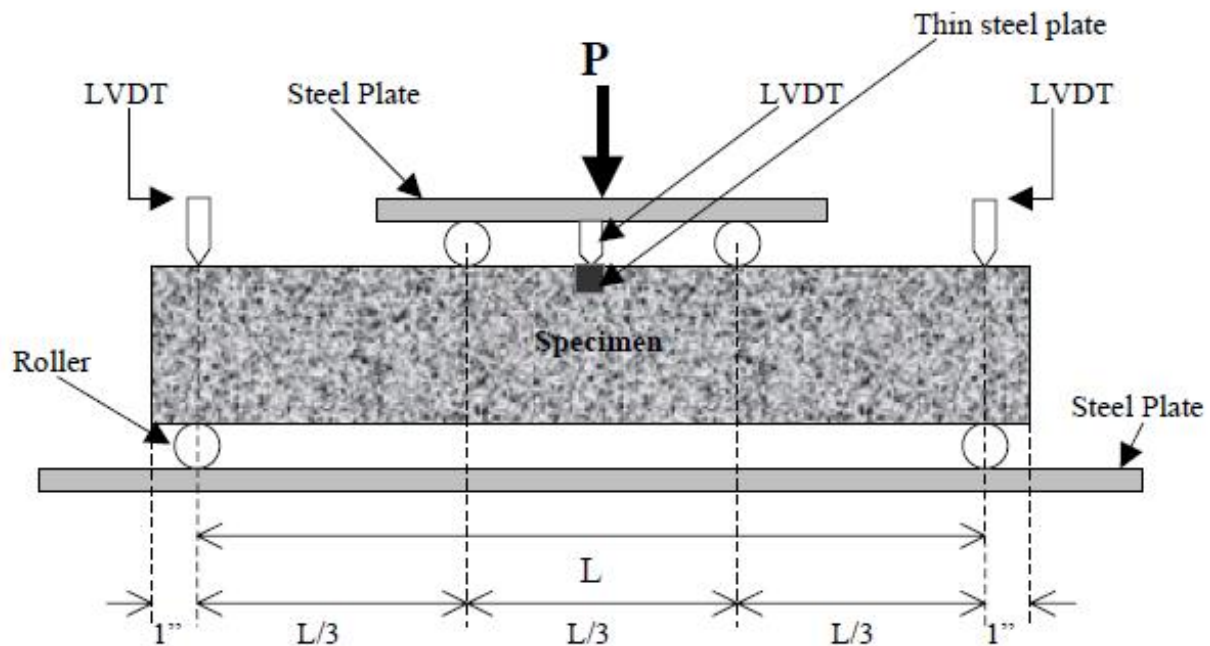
Third point loading test arrangement (Guirola, 2001).
